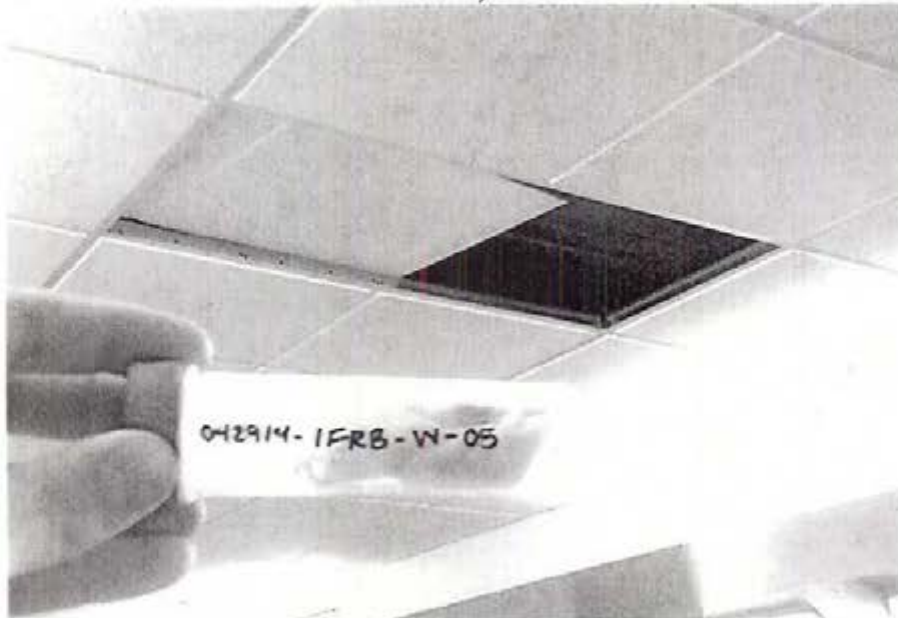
Lead wipe sample (042914-IFRB-W-05) collected from old wood paneling above the drop ceiling; near hallway to classroom.
